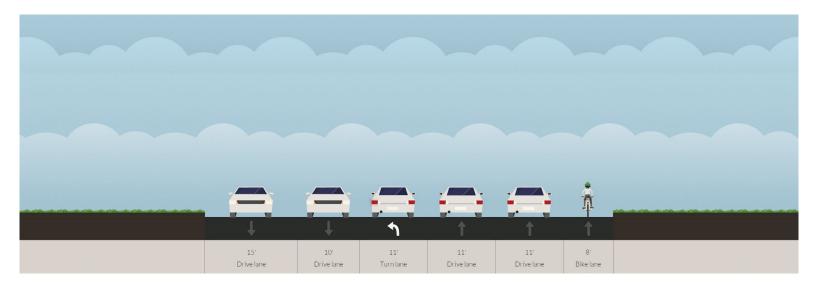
Cabot Street-Rantoul Street Essex Bridge Approach: Existing Configuration
